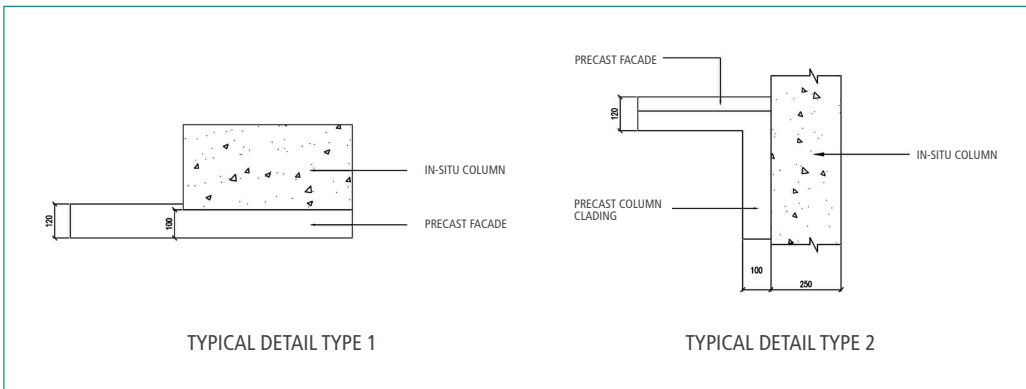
Examples of precast façade as the form for cast in situ column
